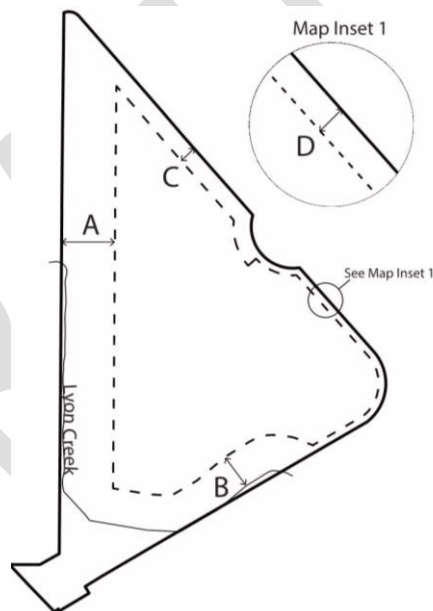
Minimum setbacks for freestanding parking structures.
